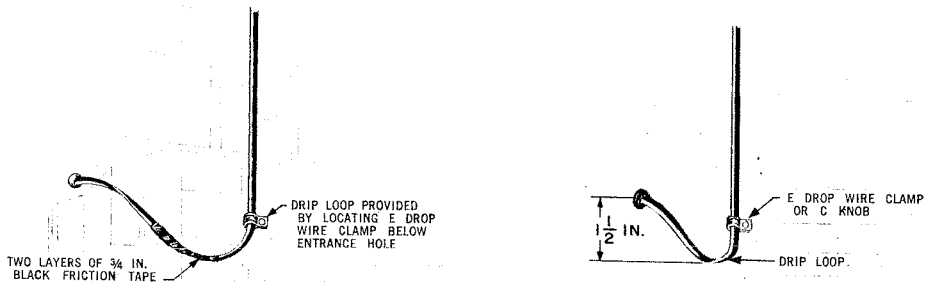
Last Attachment (Building Entrance Hole Does Not Slope Upward from Outside)
